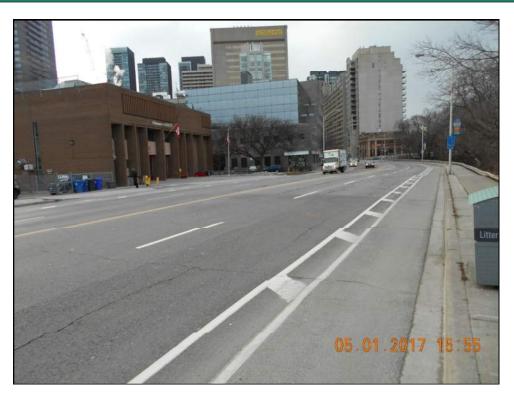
Looking West above the Tunnel (on Bloor Street, Fire Station Noted)
